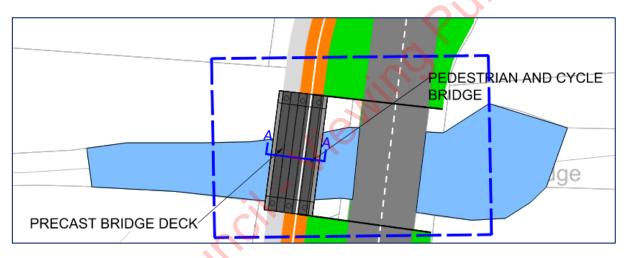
Schematic Plan of new Pedestrian and Cycle Bridge Structure
